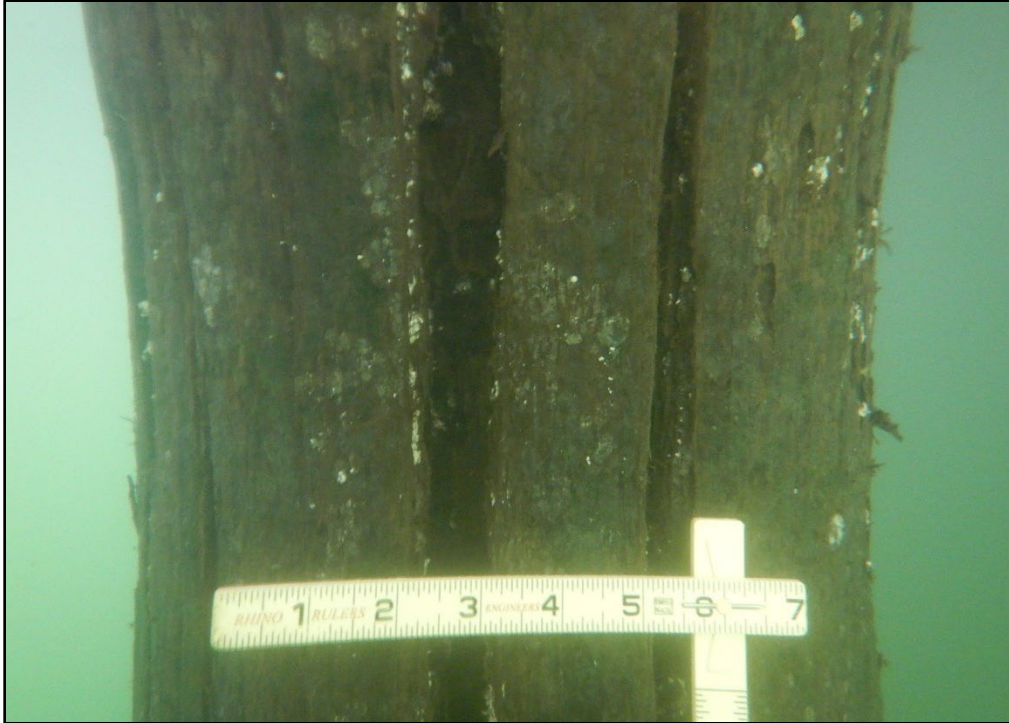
Timber Pile supporting the Coal Pier with up to 40 percent section loss and hollowing due to marine borers, looking east.
